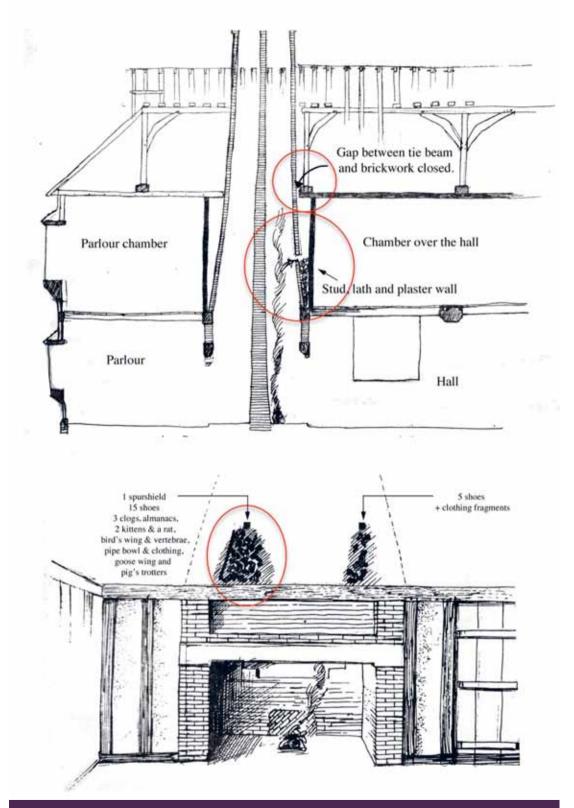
Barley House Farm, Winston, Suffolk. The position of the accumulated deposits found behind a first-floor 17th century internal lath and plaster wall above the ceiling of the hall fireplace. (Photograph/drawing: Timothy Easton)
